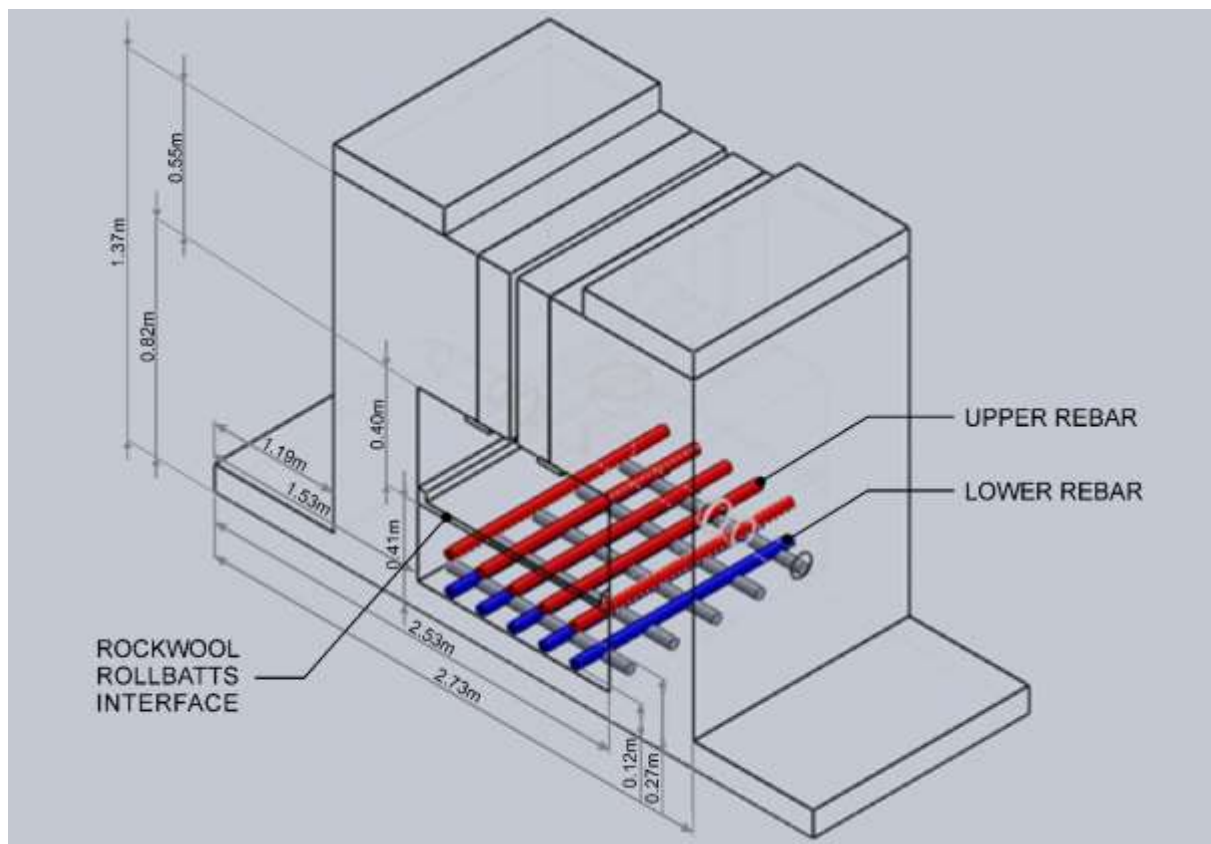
3D cross-section at joint “B” – actual construction details.
